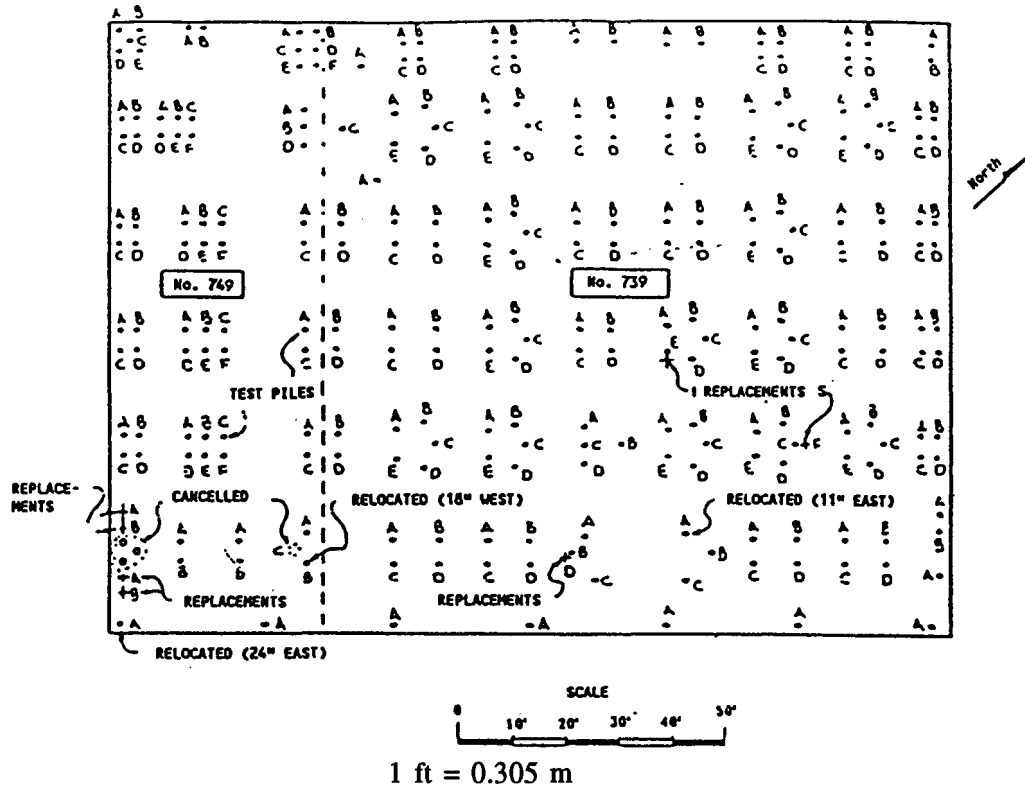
Plan of micropile arrangement -- Boylston Street, Boston, Massachusetts (Bruce, 1988 and 1989).
